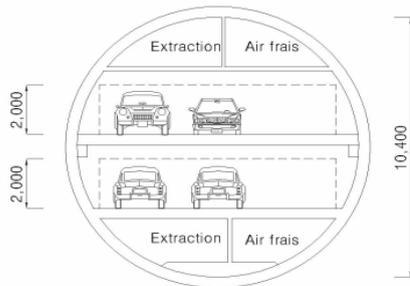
A86 East tunnel cross tunnel in France, Paris [2]
